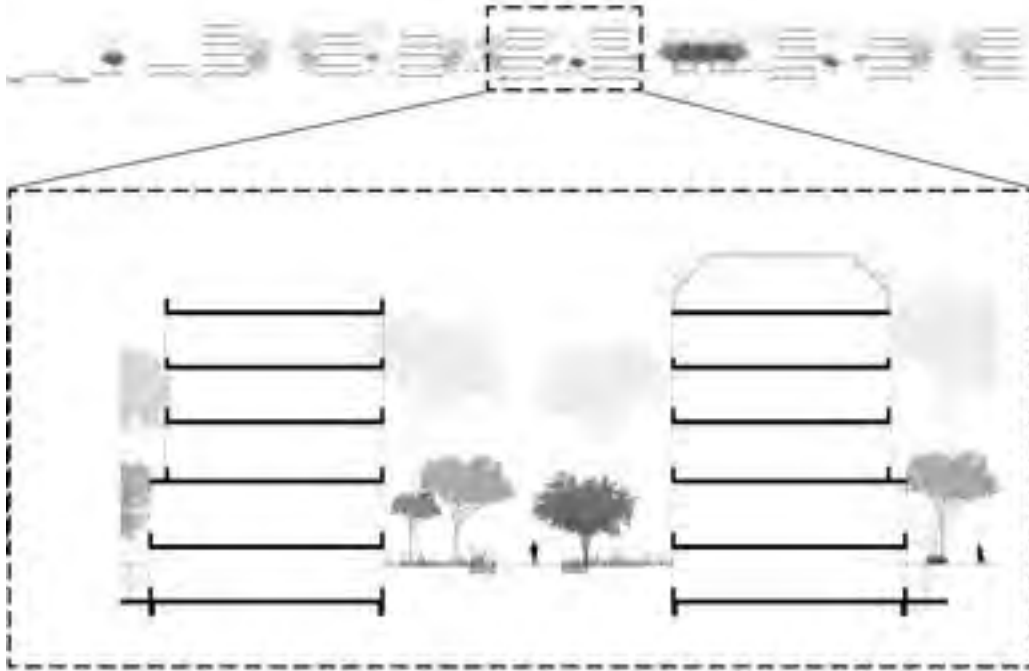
PROPOSED SECTION CUTTING PERPENDICULAR TO COMMONWEALTH AVENUE, PHOTO CREDIT: YIWEI HUANG
